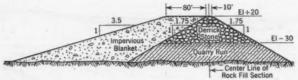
ORIGINAL TYPICAL SECTION OF EASTPORT AND LUBEC DAMS
